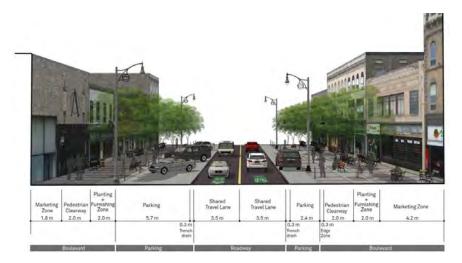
2-Lane with Shared Use Lanes and Angled Parking (Source: City of Guelph Downtown Streetscape Manual & Built Form Standards, 2014)
